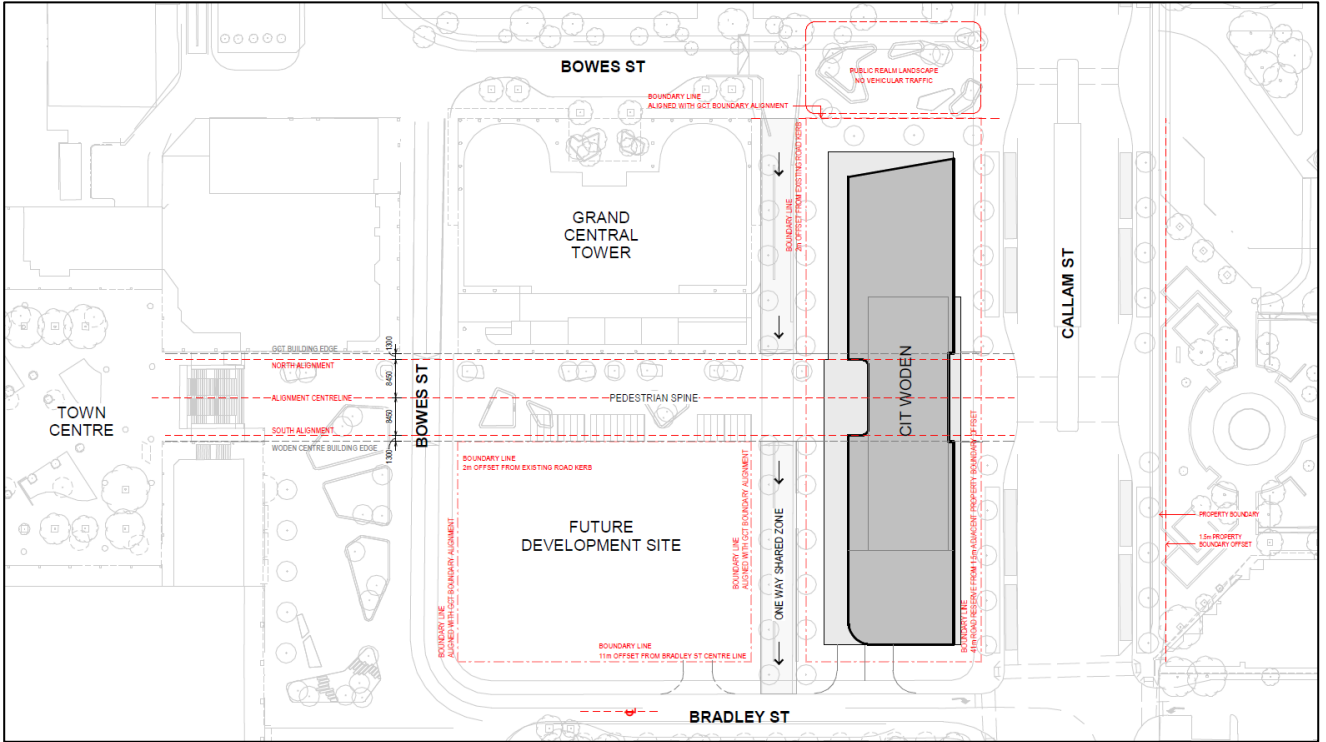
Site Layout of CIT building (Source: CIT Design Report, Arup 2020)
